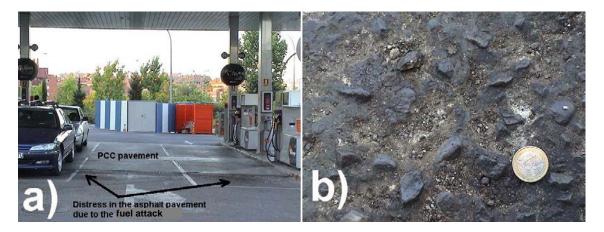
a) Asphalt pavement affected by fuel spills. b) Pavement stress detail
